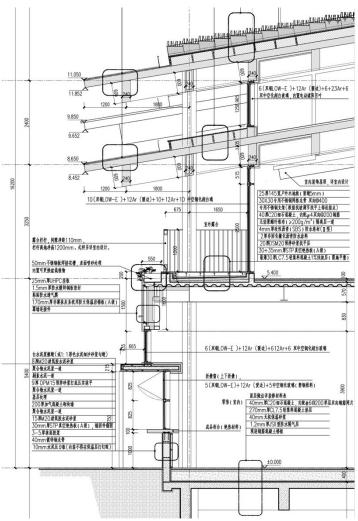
A DETAIL SECTION OF THE MARKETPLACE ALREADY BUILT AND A SECTION OF THE EXHIBITION SPACE
